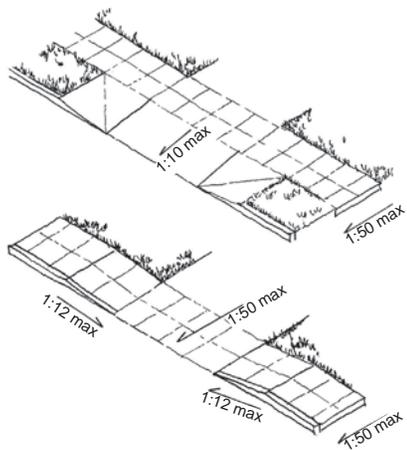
Driveway Treatments (Encourage) Alternatives for driveway treatments at sidewalks that create even walking surfaces.
